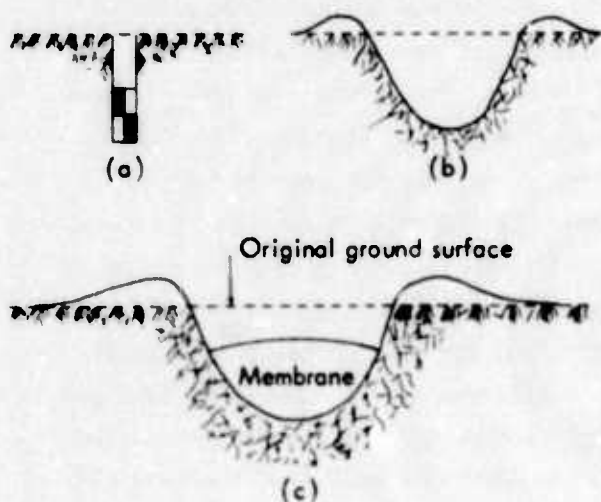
Single crater for emplacement of POL storage facility.⁸
